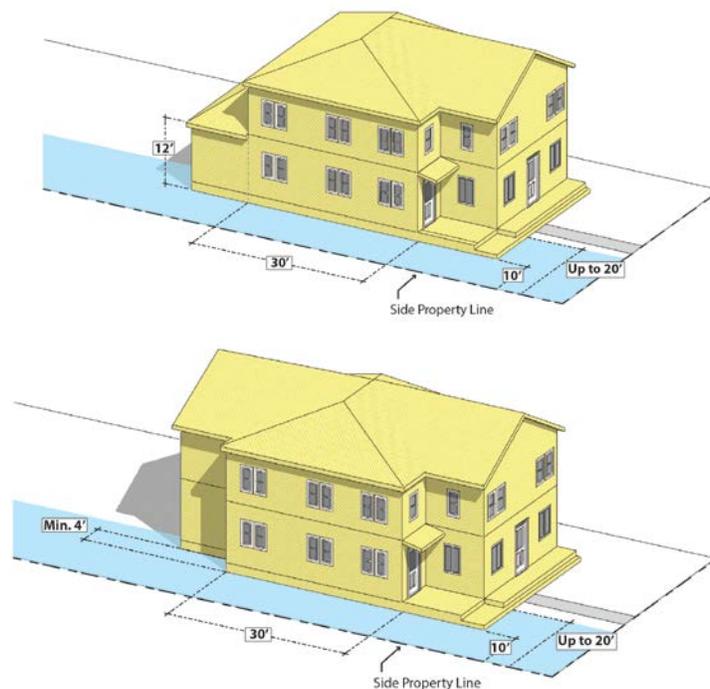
Required side wall articulation through stepdown (top) or variation in wall plane (bottom).
